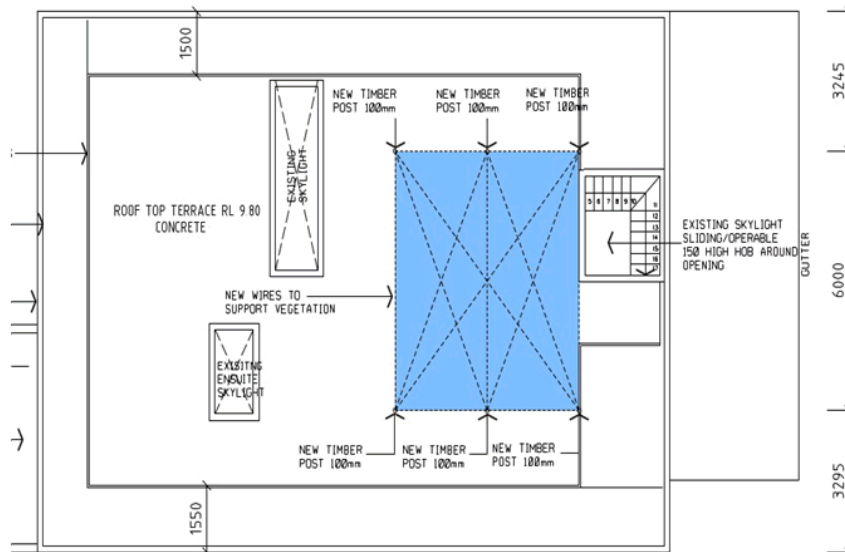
Amended plan showing a reduced covered area and greater setbacks from the building edge.
